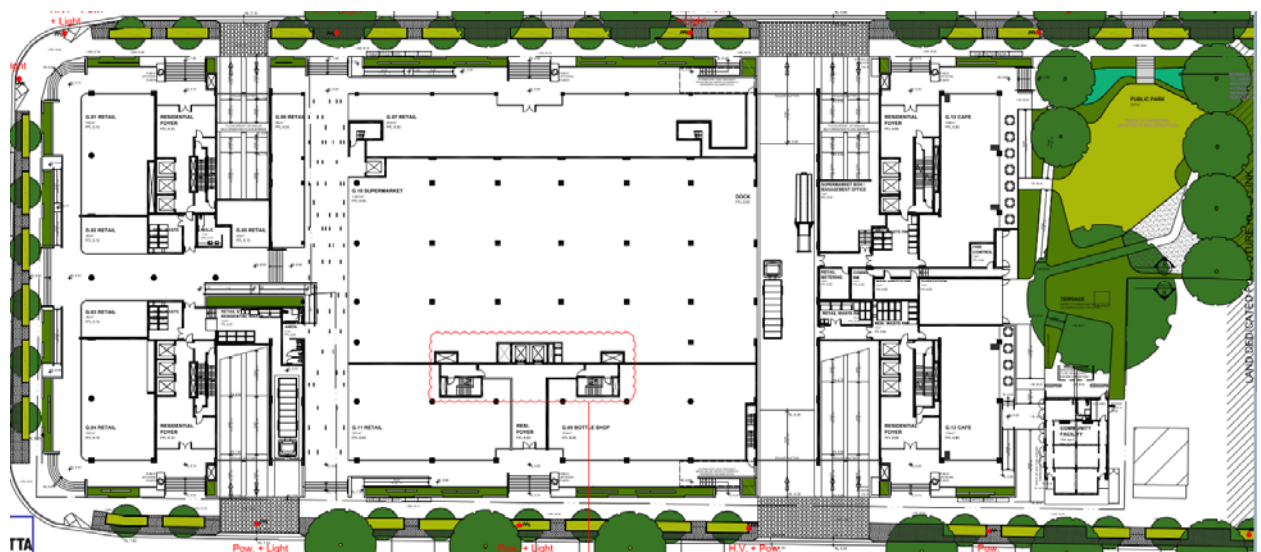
Approved ground floor plan under DA/961/2015/A Source: Marchese Partners, Revision G, dated 14 May 2018
